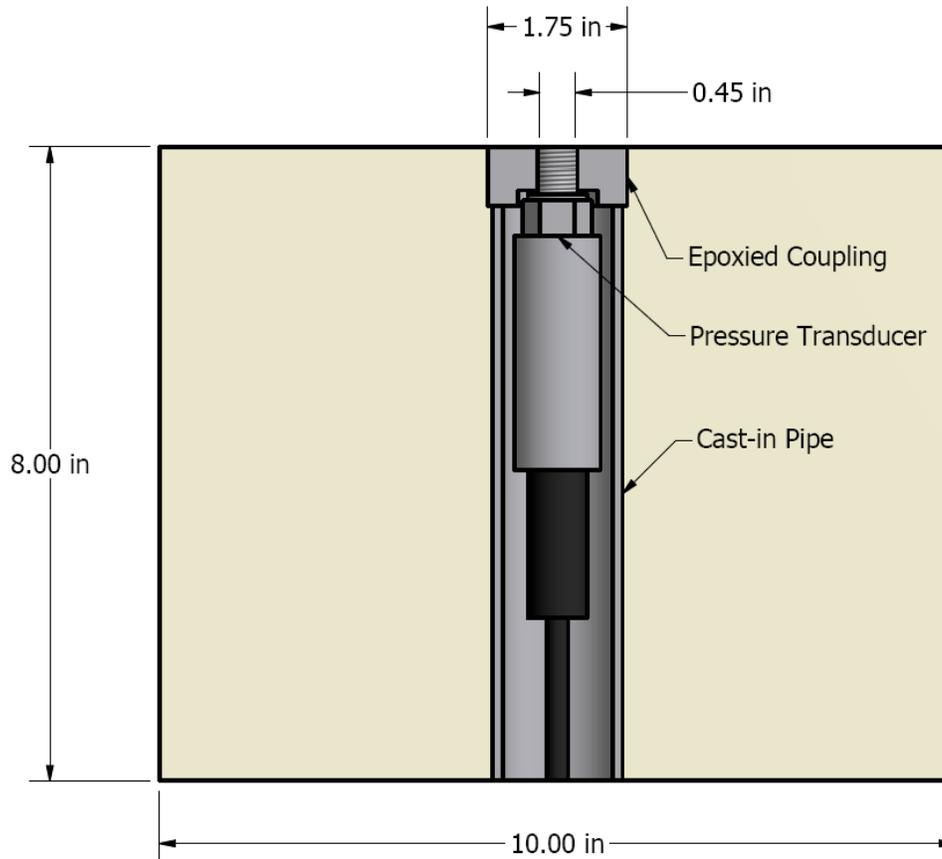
Profile view of a cross-section of a concrete specimen instrumented with a pressure transducer
